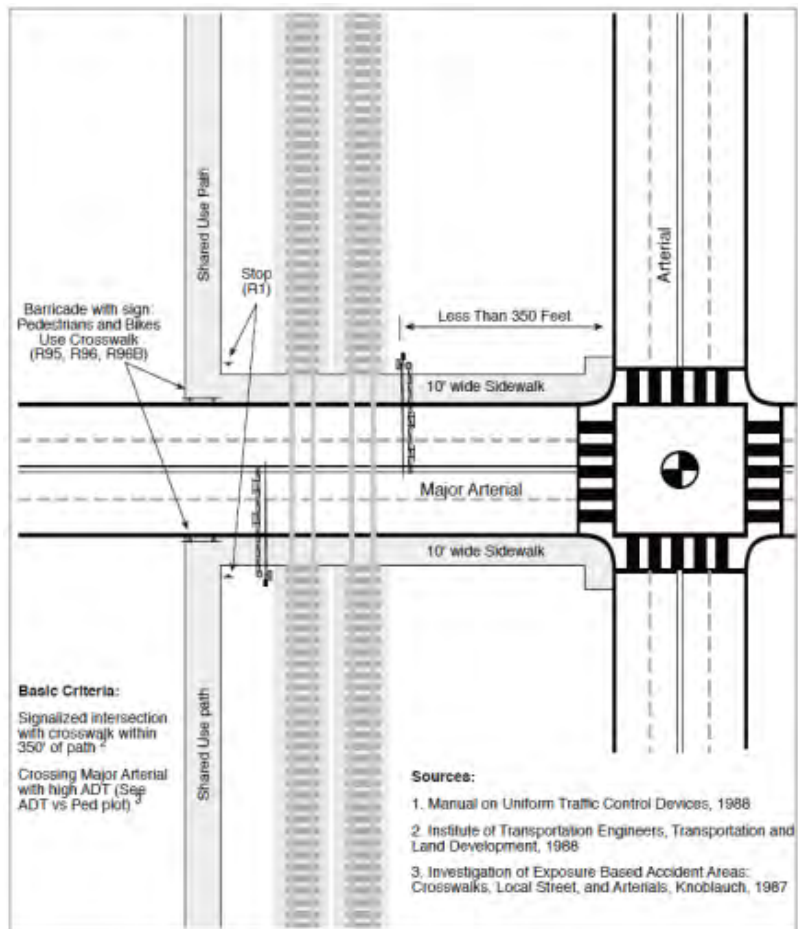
FHWA “Roadway Crossing Type 3 (Reroute Trail Users to Nearest Signalized Intersection)” (Rails with Trails 2021)
